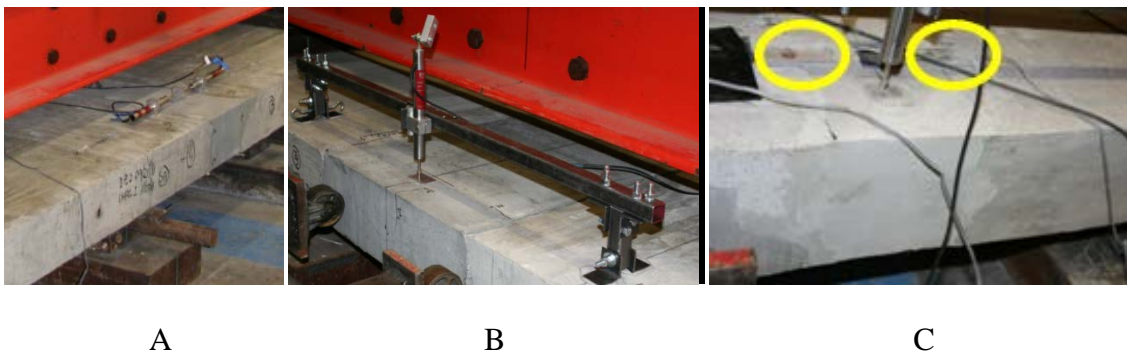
Deck-level connection specimen instrumentation: A) – two horizontal LVDT's at the connection interface (both faces); B) – one vertical LVDT at the center of the connection; C) – two strain gages at the interface (both faces).
